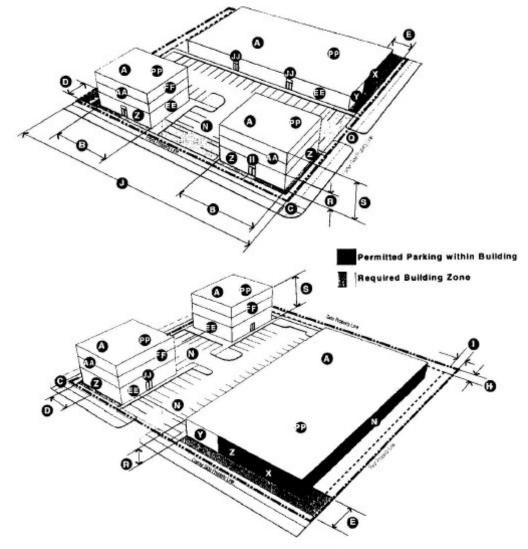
T: COMMERCIAL CENTER BUILDING TYPE DIAGRAM.
